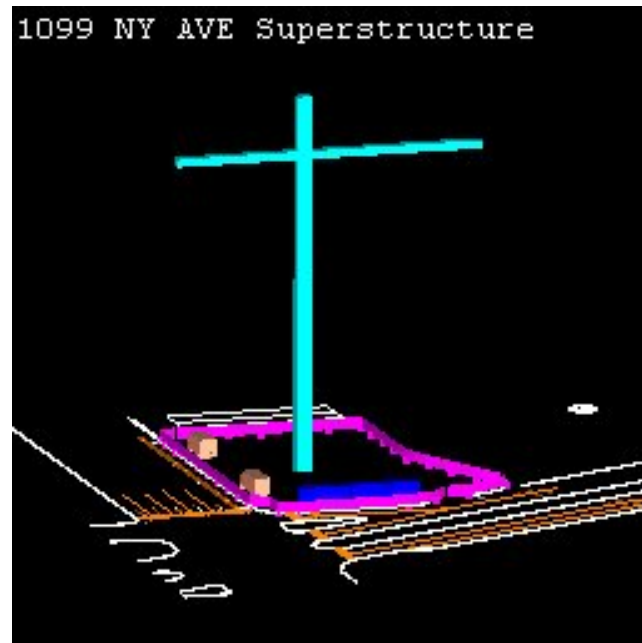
The site layout prior to construction of the superstructure. Trailers are located along New York Avenue, the crane is located at the center of the site, delivery trucks enter through the south gate and exit through the north.
